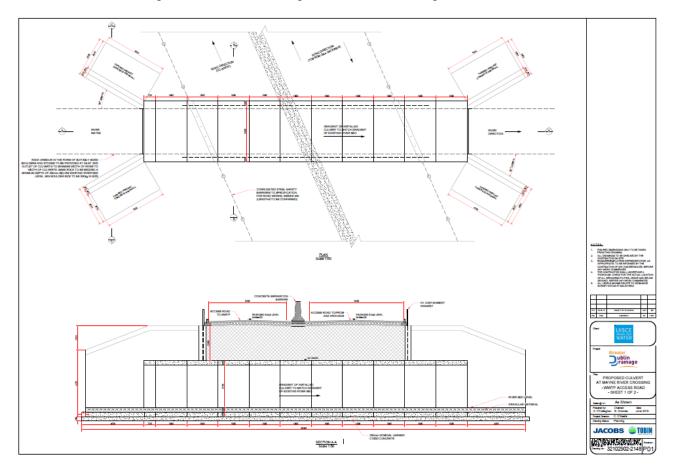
Extract from drawing 32102902-1067 showing extent of culvert.
